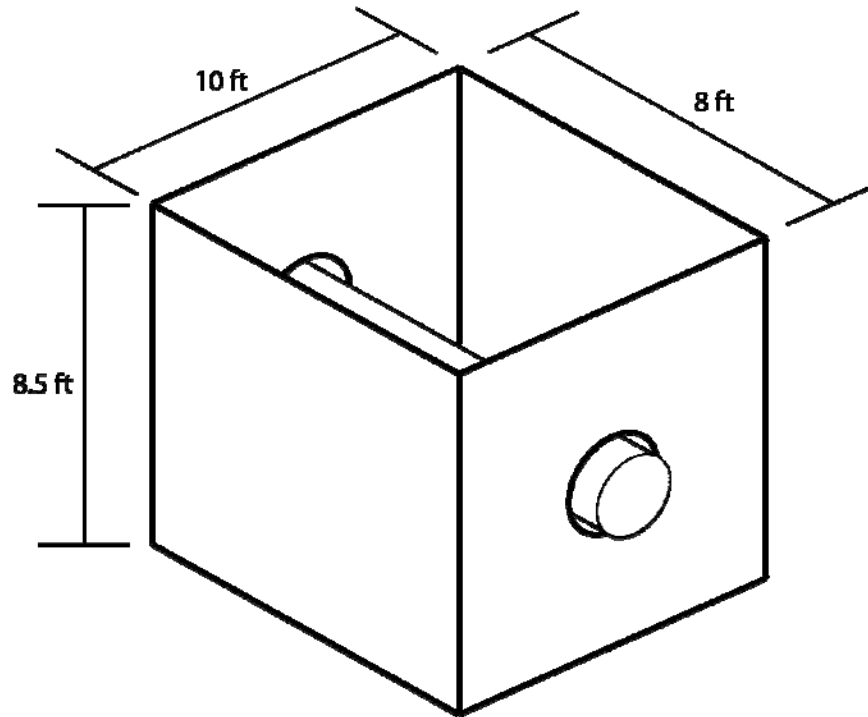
Dimensions of Soil Box and Direction of Test Pipe.
